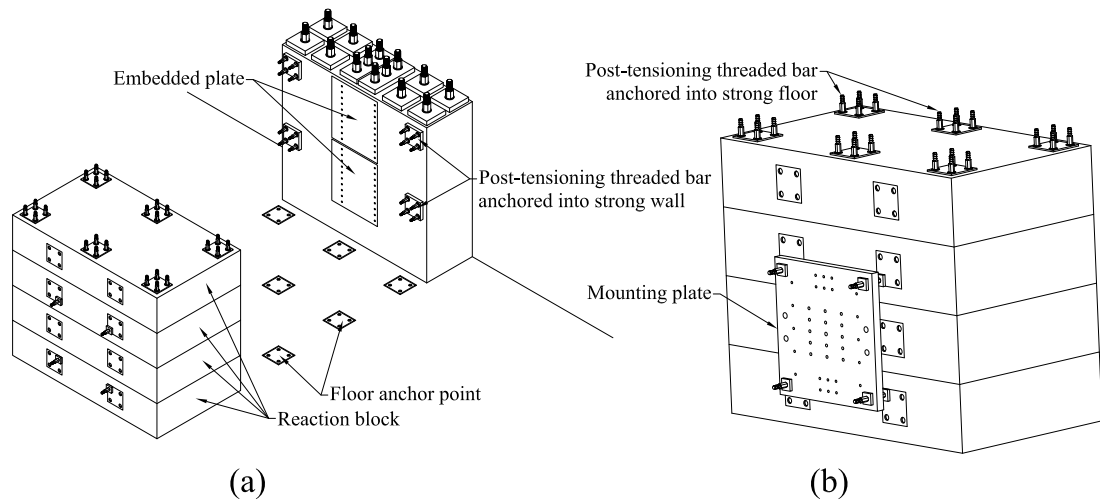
Reaction walls of the testing system: (a) view towards the front side of the fixed reaction wall (b) view towards the front side of the movable reaction wall.
